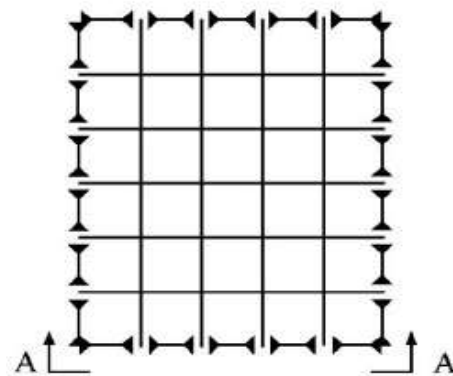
Plan of Twenty storey benchmark building, ( Y.Ohtori et al., 2004)
